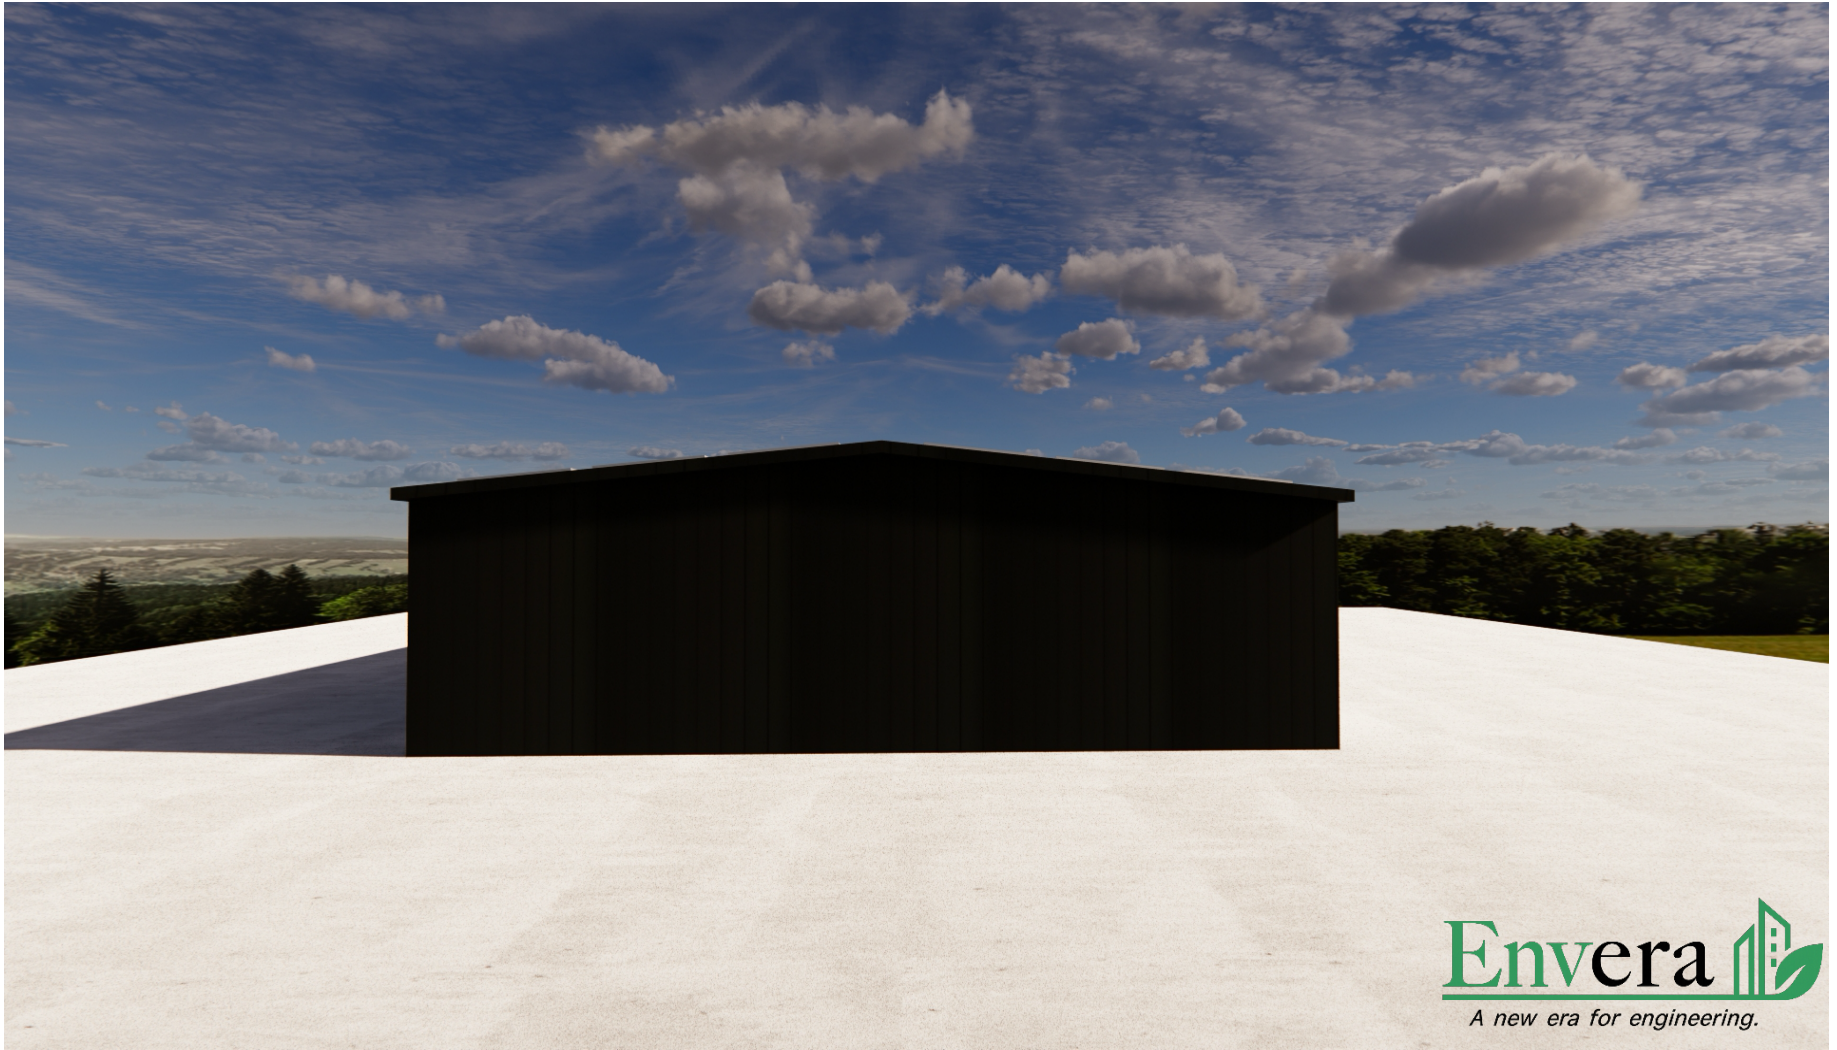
North elevation render: Mechanical pad located on this side (not shown).
